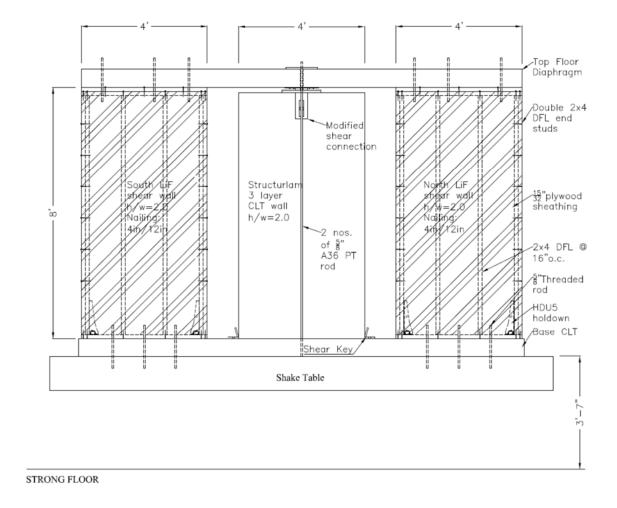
Elevation drawing of CLT-LiFS shearwall assembly with modified shear connection design
